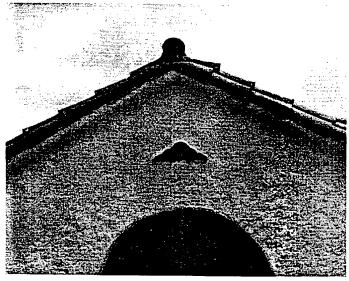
ARCHITECTURAL DETAIL EXAMPLES
